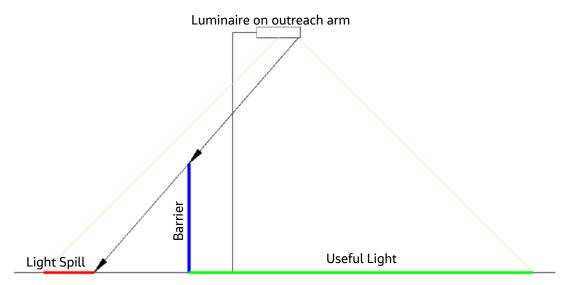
Impact on Light Spill of Column Being Moved Away and Luminaire on an Outreach Arm
